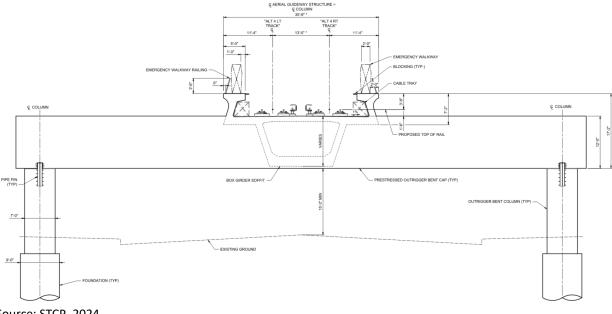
Typical Aerial Straddle-Bent Cross-Section
